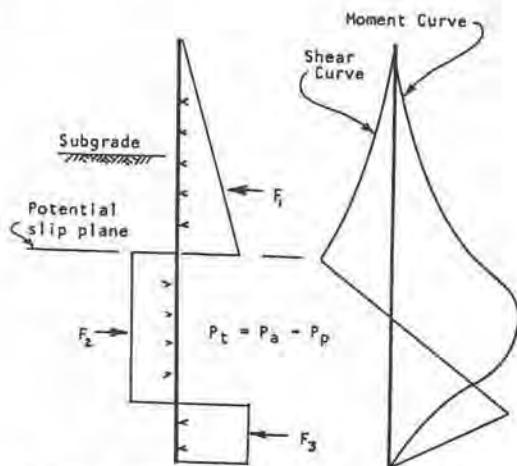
Initial approach to the structural design of cylinder pile walls: first contract (1962).
